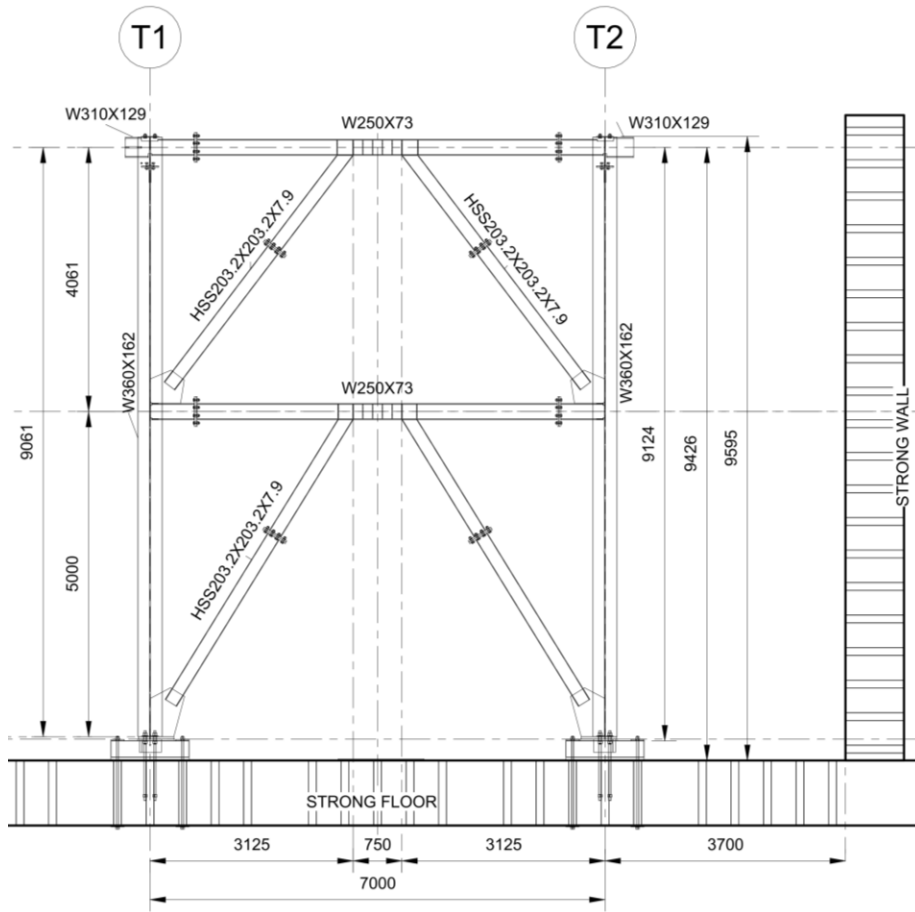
Geometry and selected members for Specimen 2 (dimensions in mm).
